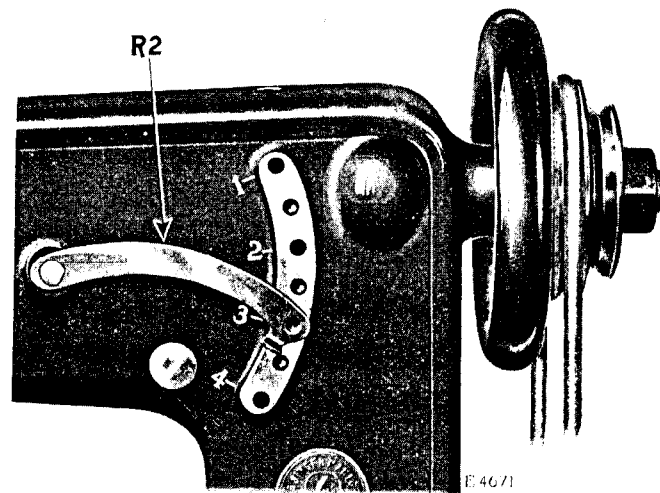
View of Machine 114w121, Showing Gear Shift Lever for Changing Speed of Revolving Spool Carrier
